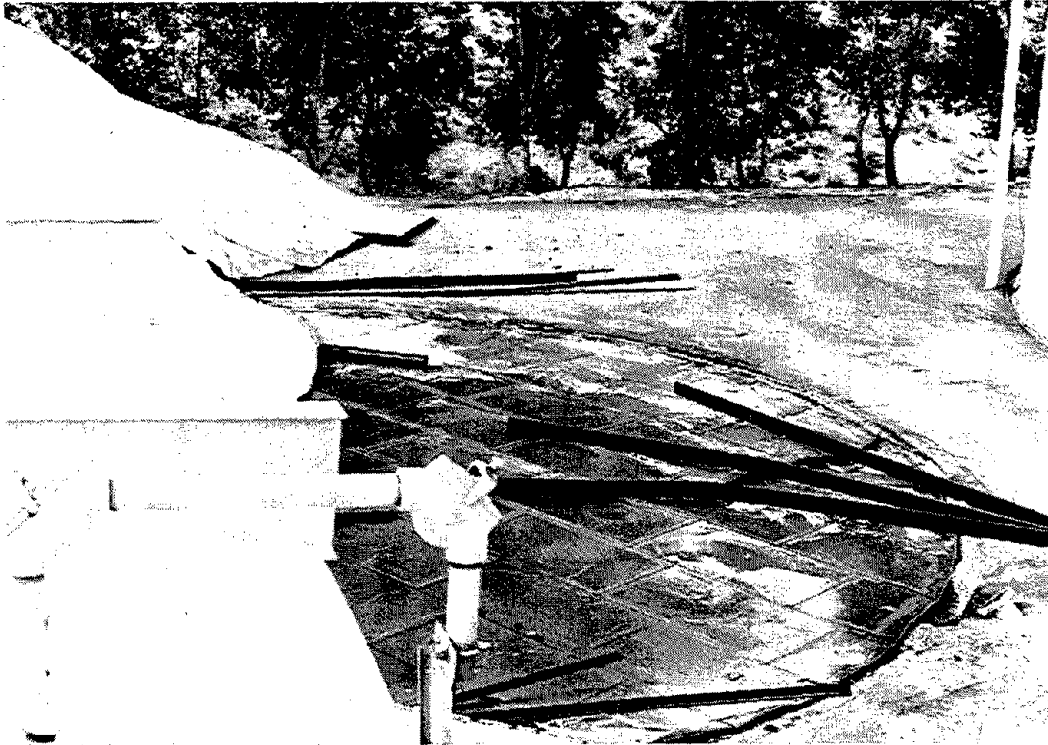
Floor of collapsed bolted tank. Tear in side wall can be seen at edge of base. (T. Cooper)
